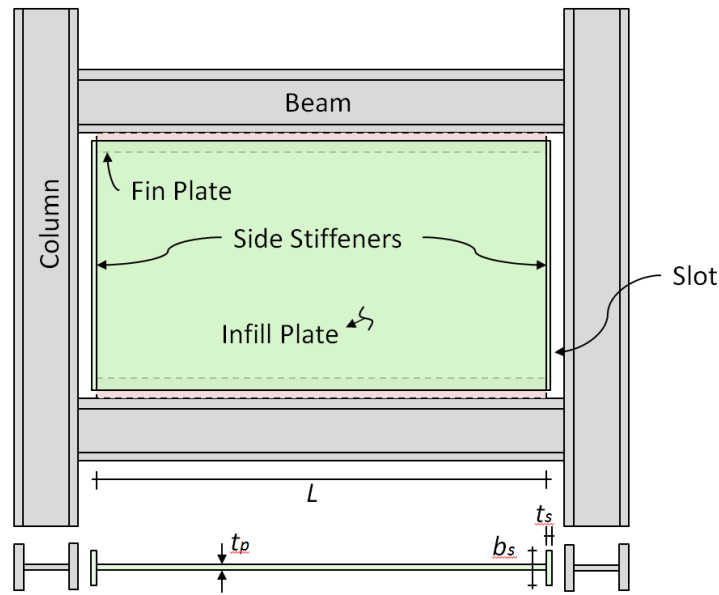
Infill panel connected to beam only with typical rectangular side stiffeners
